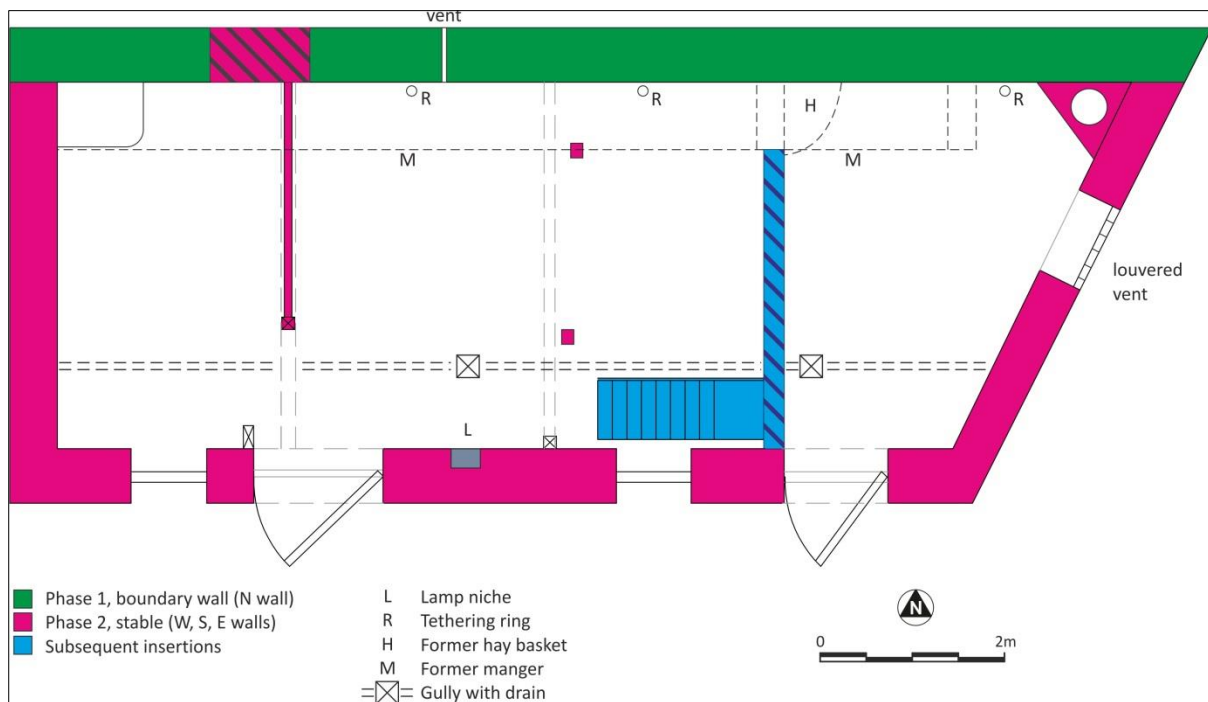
Phased plan, Ground Floor; the First Floor is single phase and without division or detail
